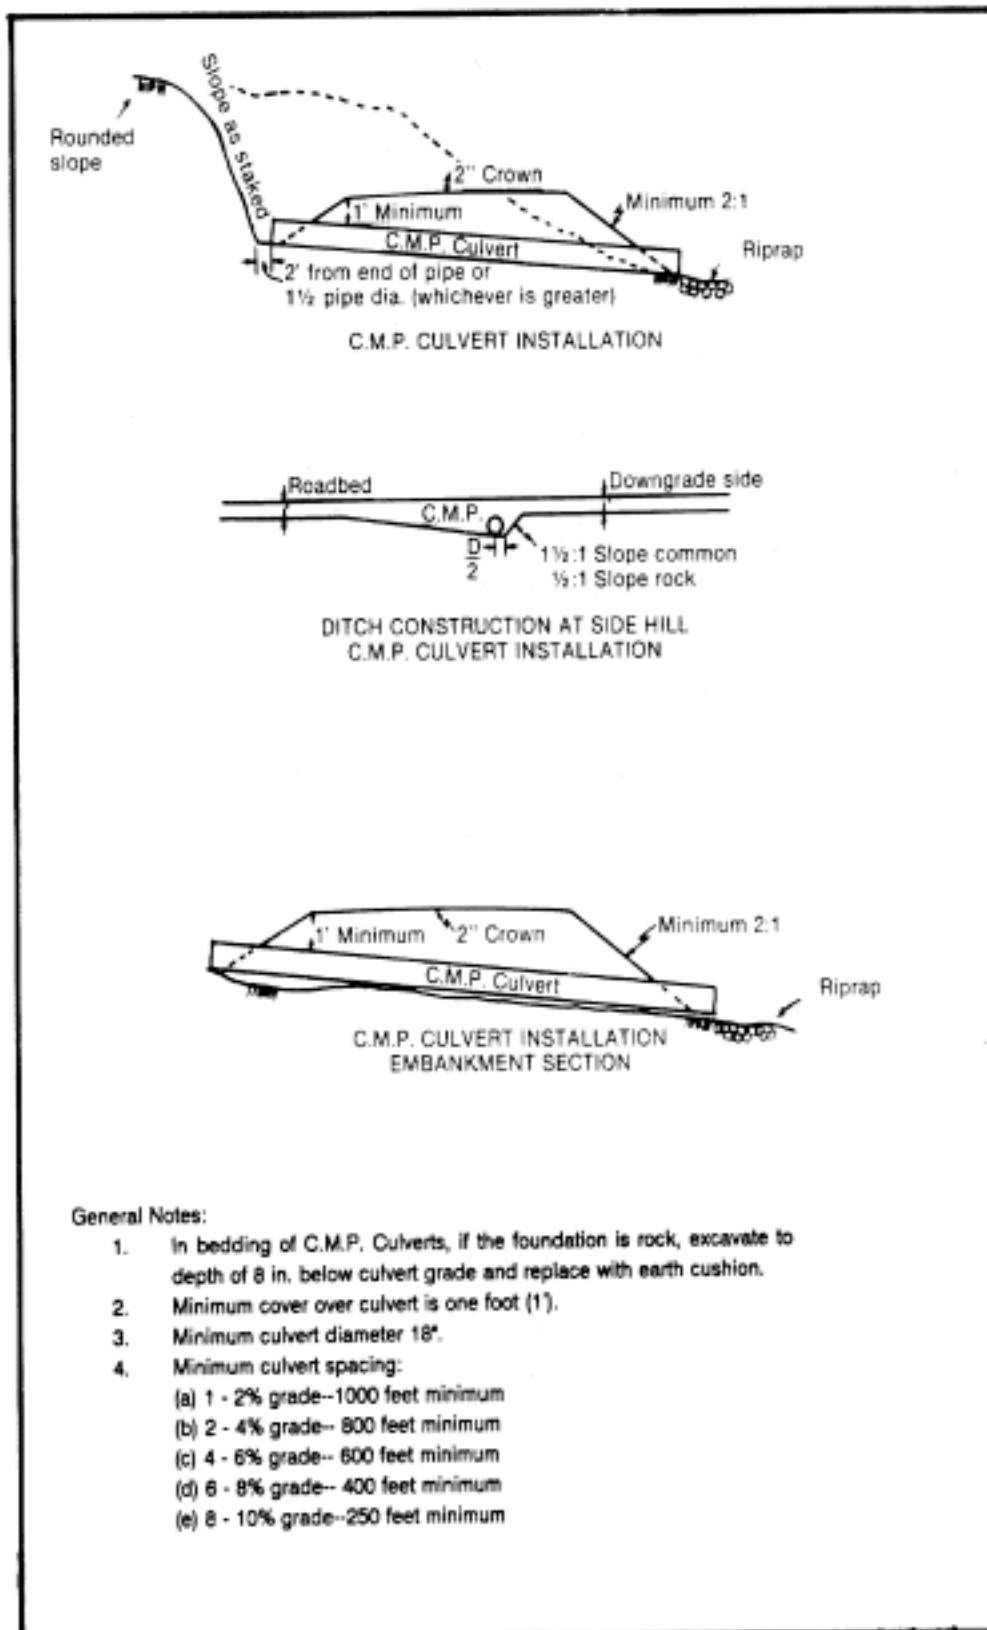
TYPICAL CULVERT CONSTRUCTION.
